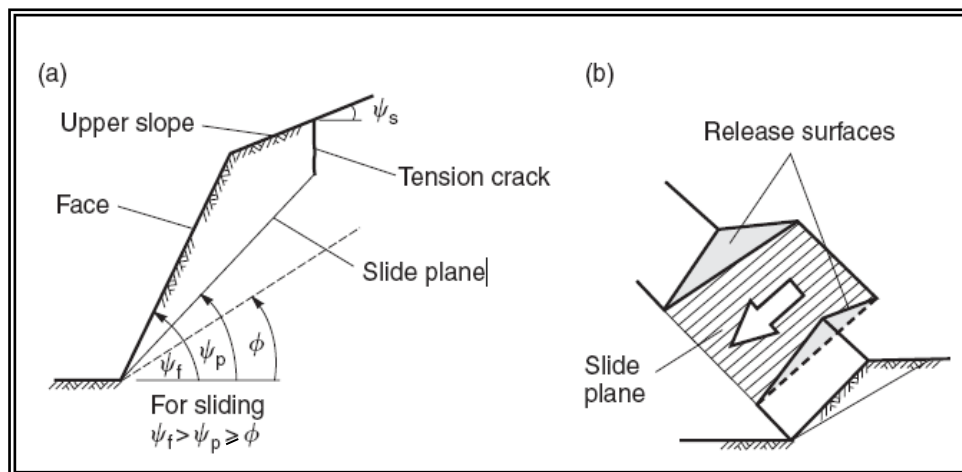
Geometry of slope exhibiting plane failure: (a) cross-section showing planes forming a plane failure (b) release surfaces at ends of plane failures. Wyllie & Mah, (2004) .
